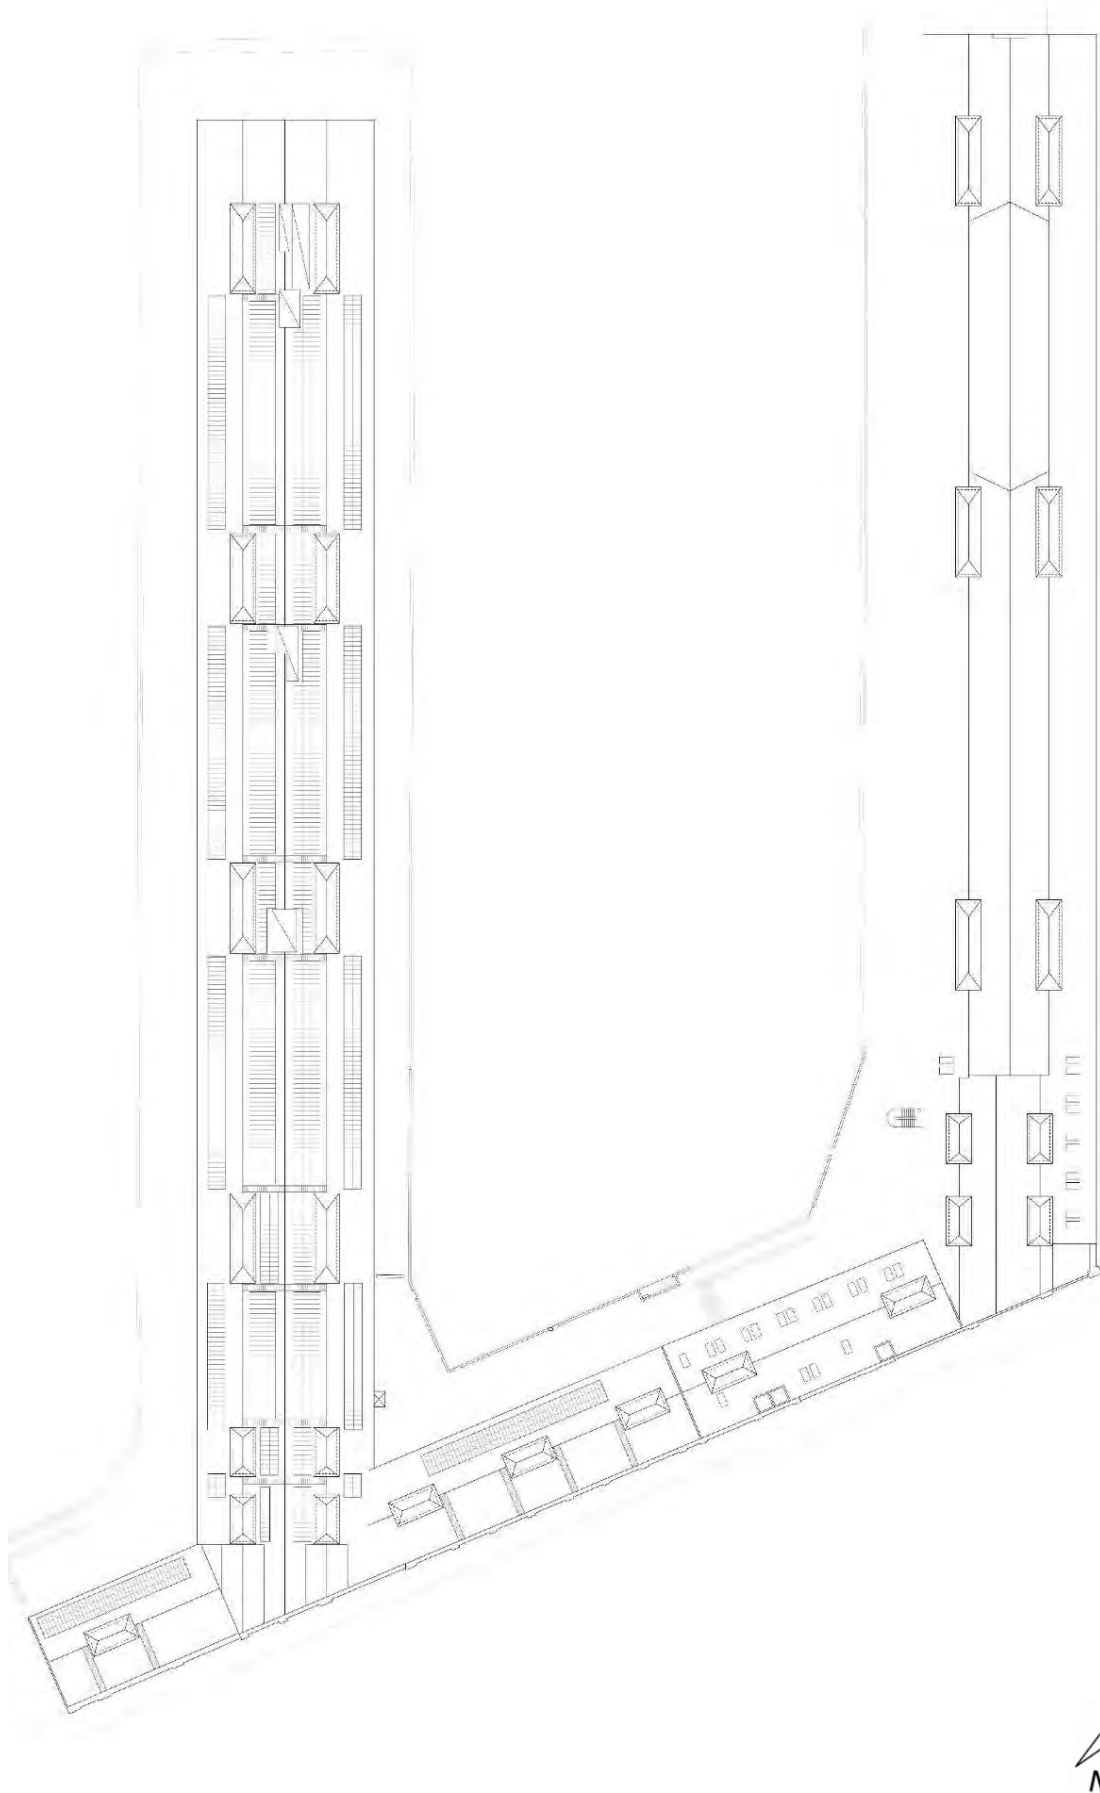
Existing Roof Plan. Resource from TZG Architects.
